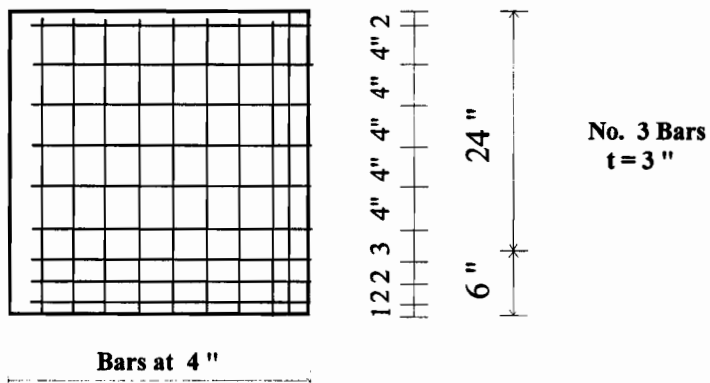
Details of reinforcement and geometry for shear panel W-2
